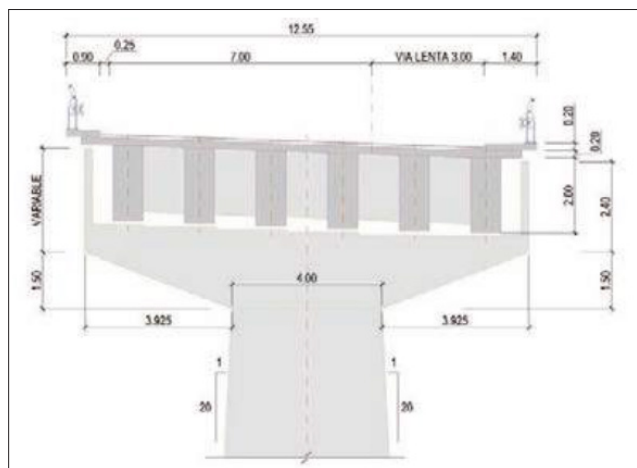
Viaduct Original Structure Cross Section, on the Top of the Piers and the Deck [11].
